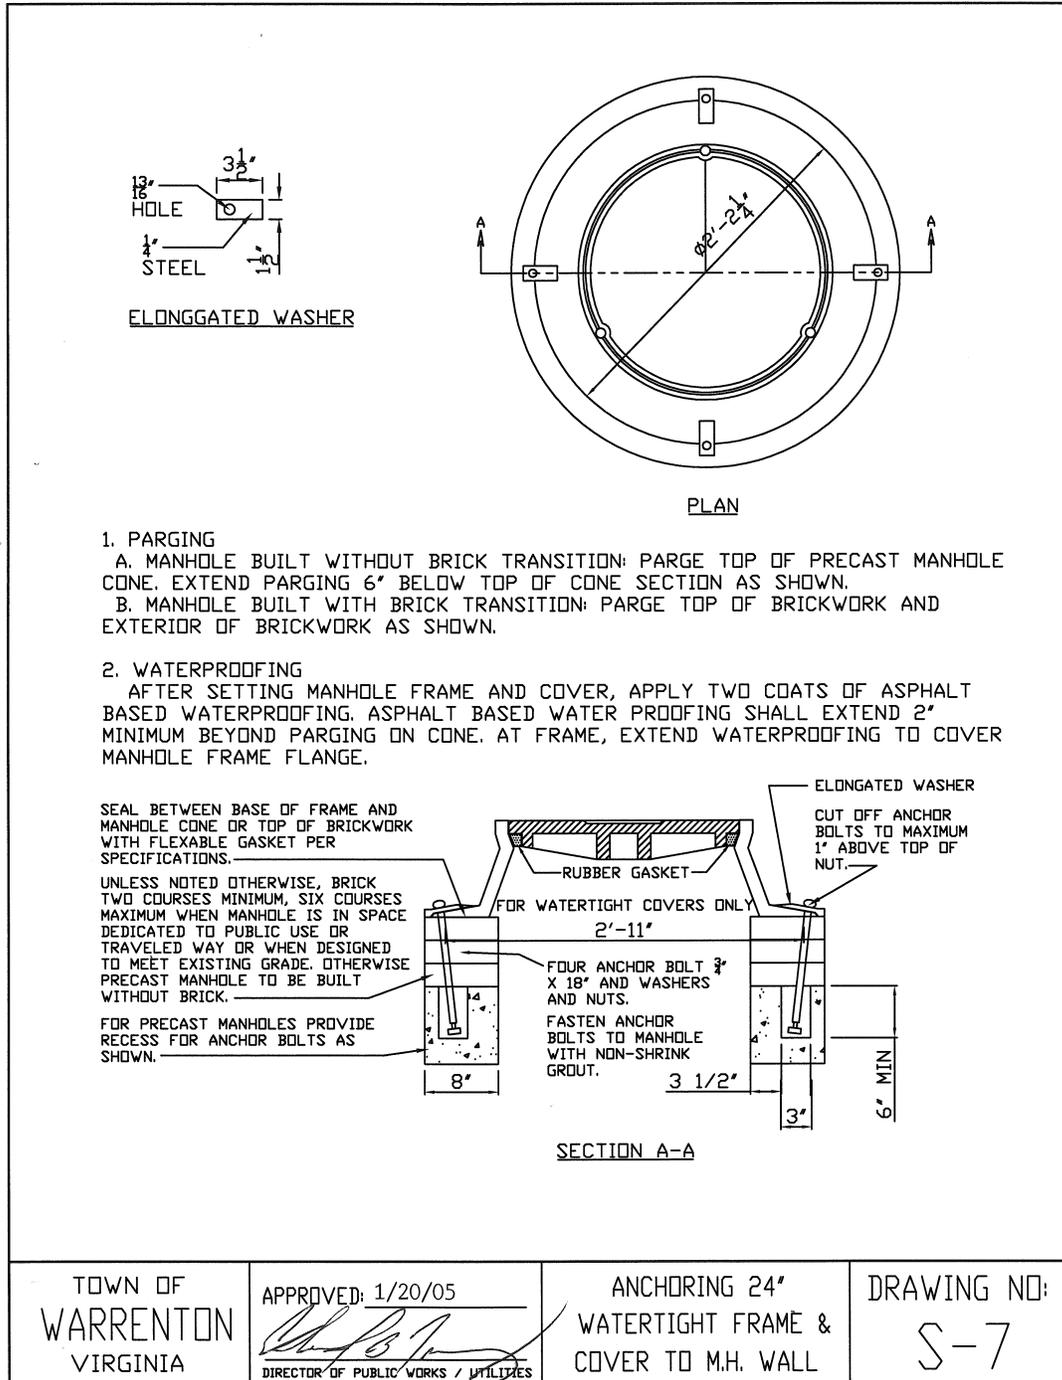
S-7 Anchoring 24" Watertight Frame and Cover to Manhole
